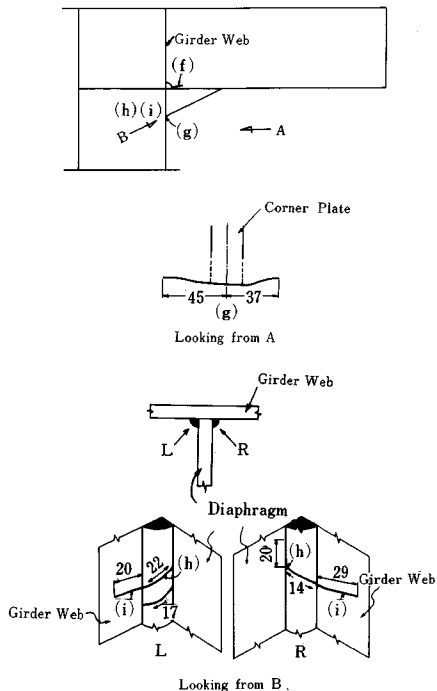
Fatigue Cracks in Test Model with Corner Plate (CP 1).
